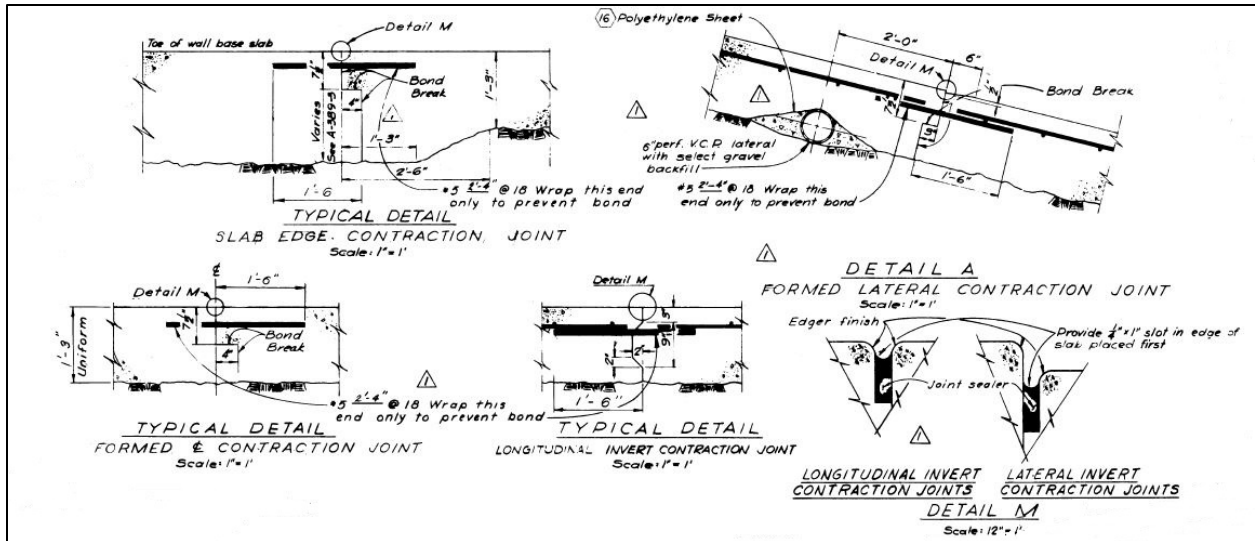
Chute Slab Joint Details (from as-built Drawing A-3B9-4)
